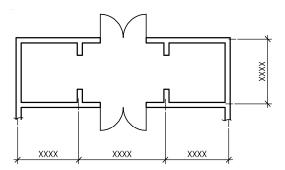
Face of stud, concrete or masonry wall dimensioning.
